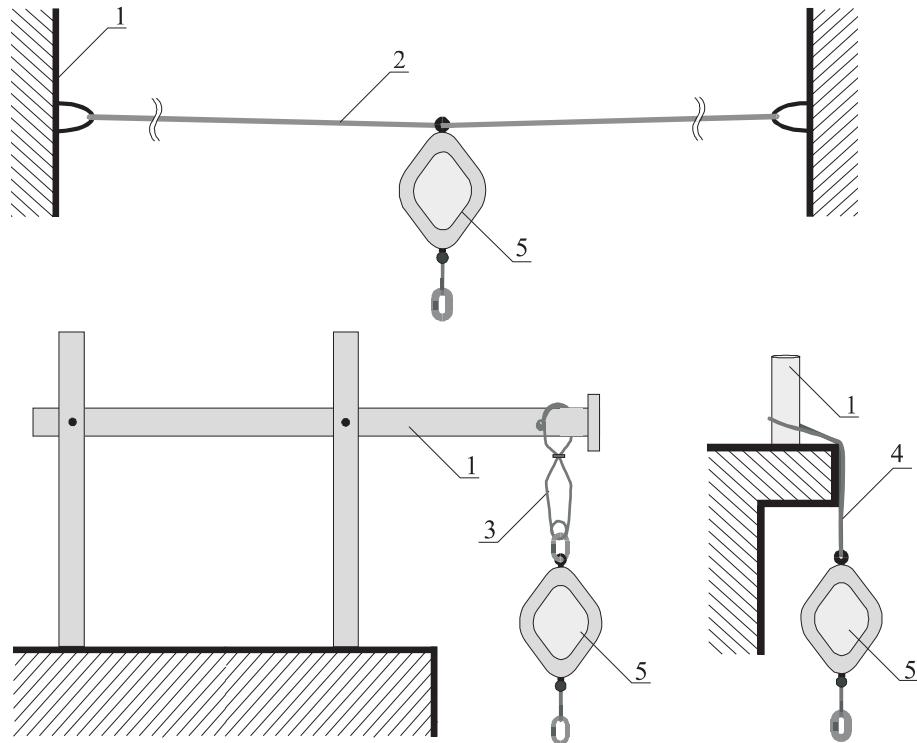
Examples of flexible anchor devices. Notes. 1—rigid part of worksite, 2—horizontal flexible anchor line, 3—formed wire clamp, 4—vertical flexible anchor line, 5—retractable type fall arrester
